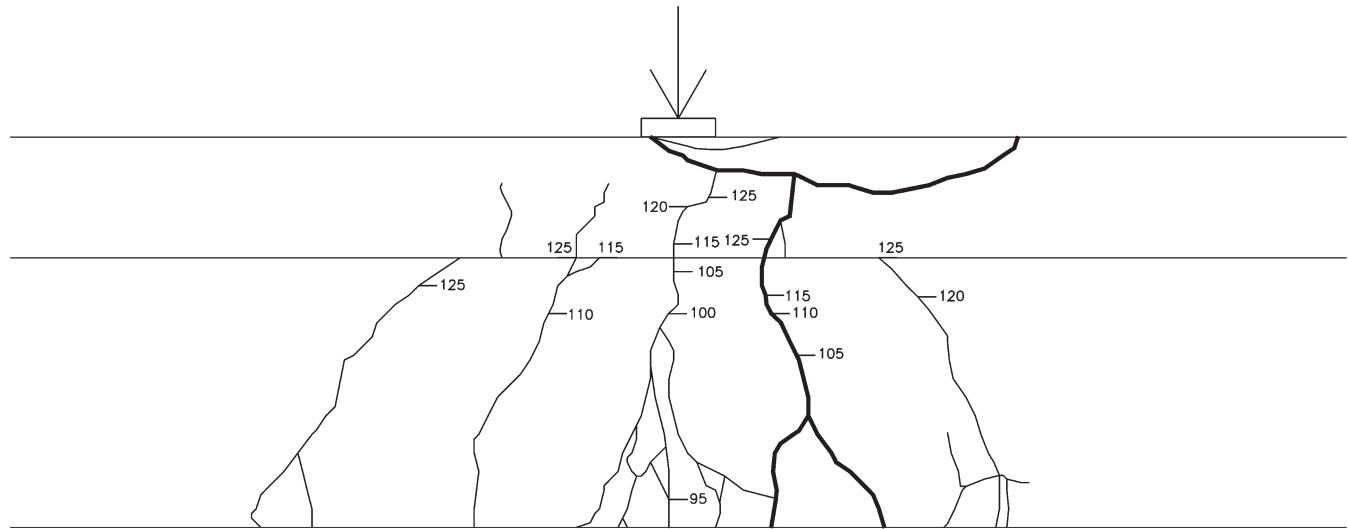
Crack patterns at failure of multiple-strand development length specimen HPC-2 (north face).
